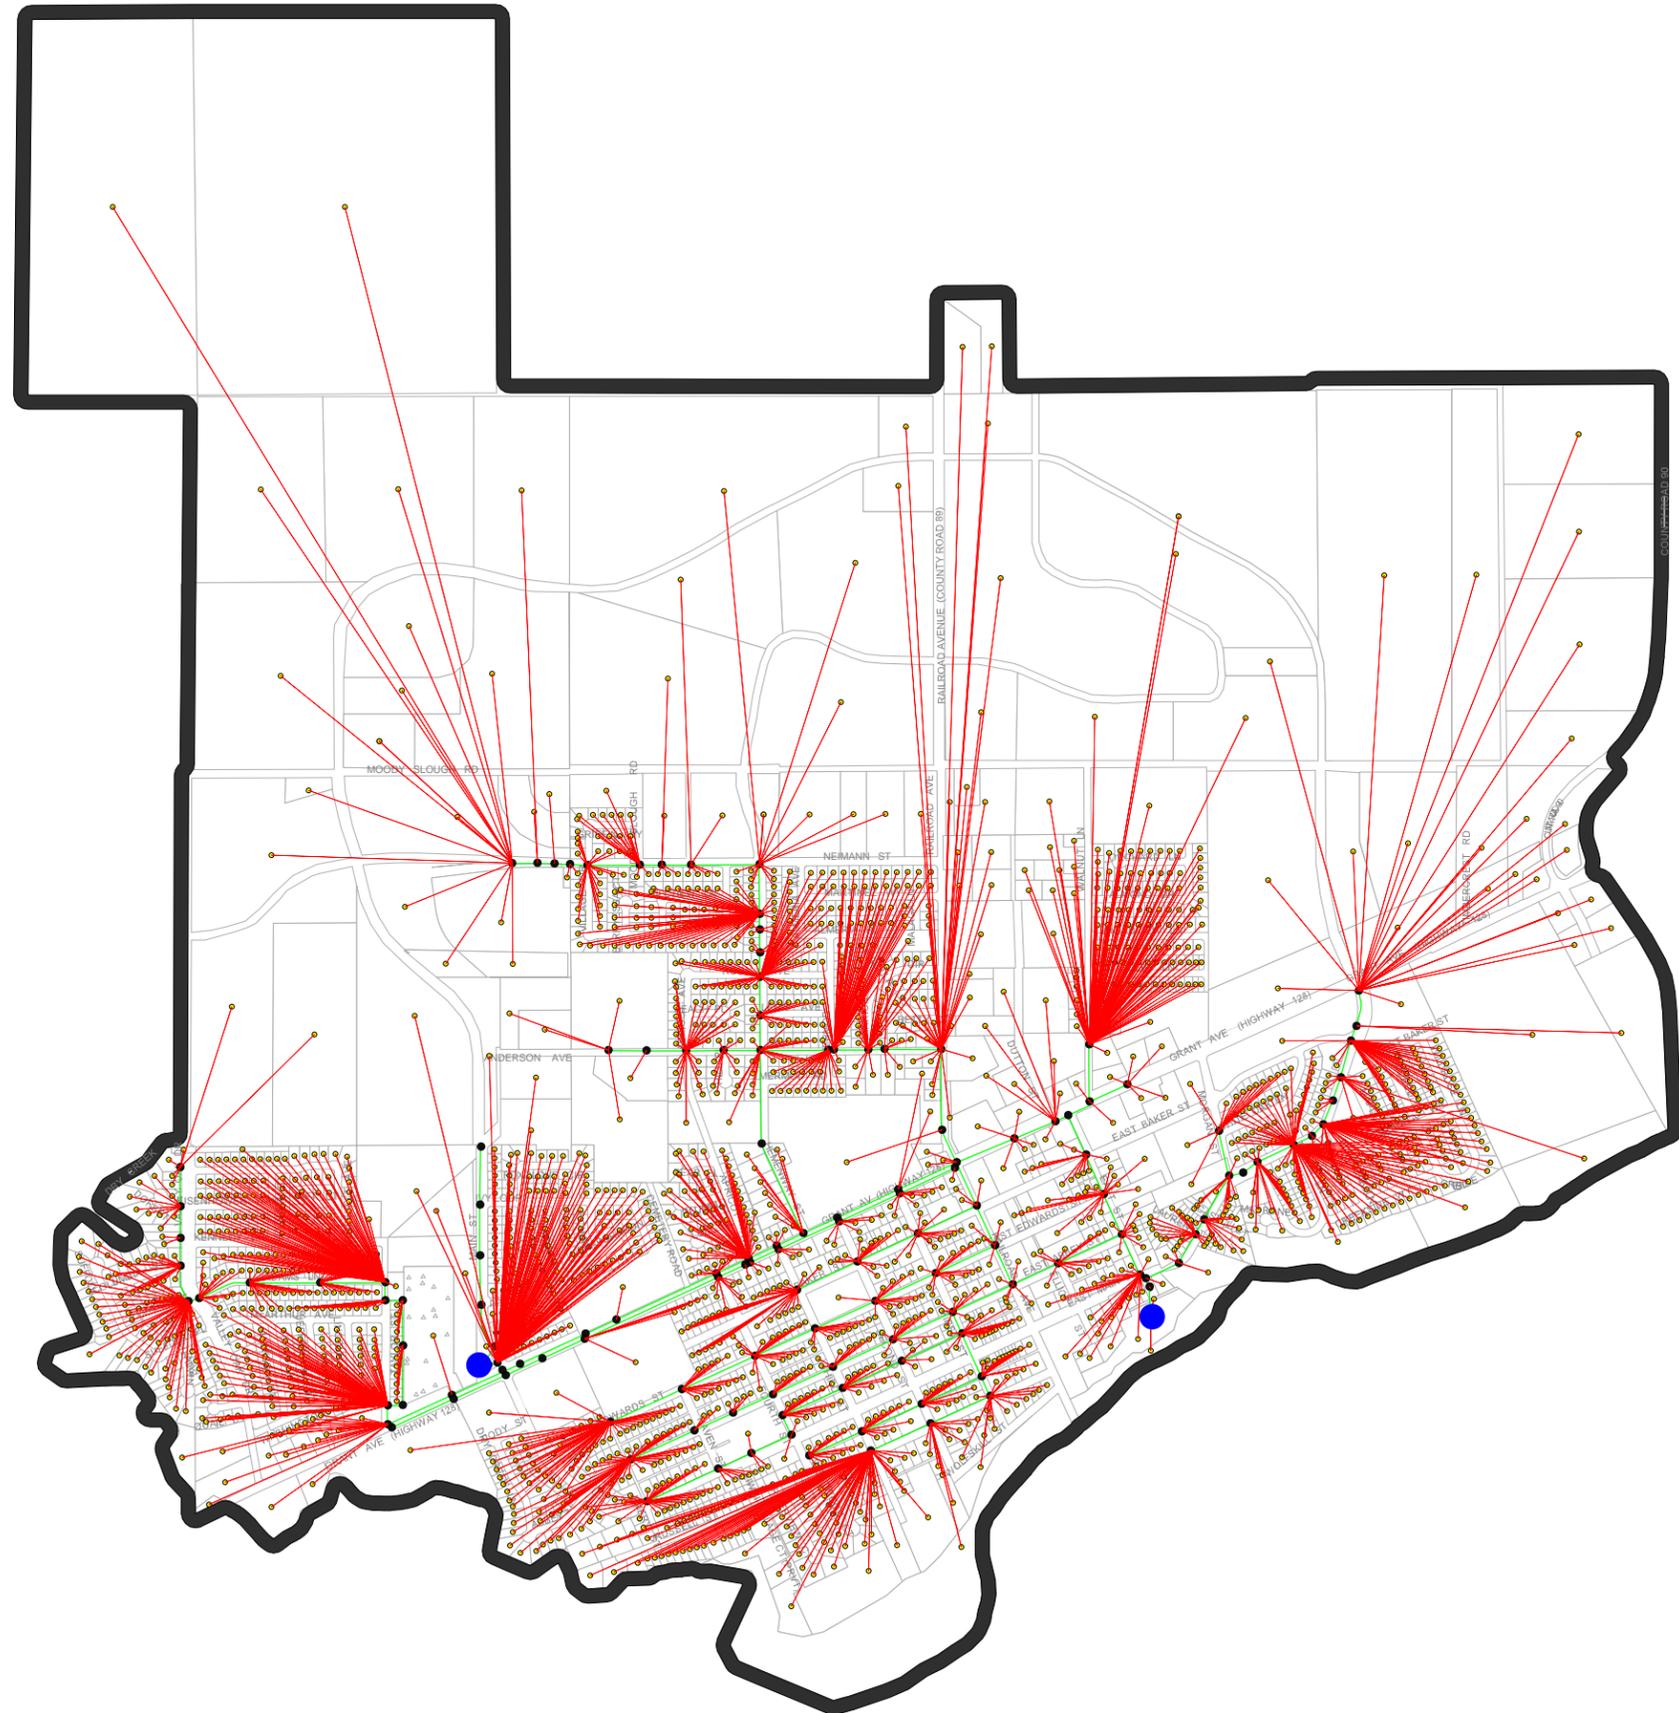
Proposed Improvements and Expansion for Sewer Collection System
